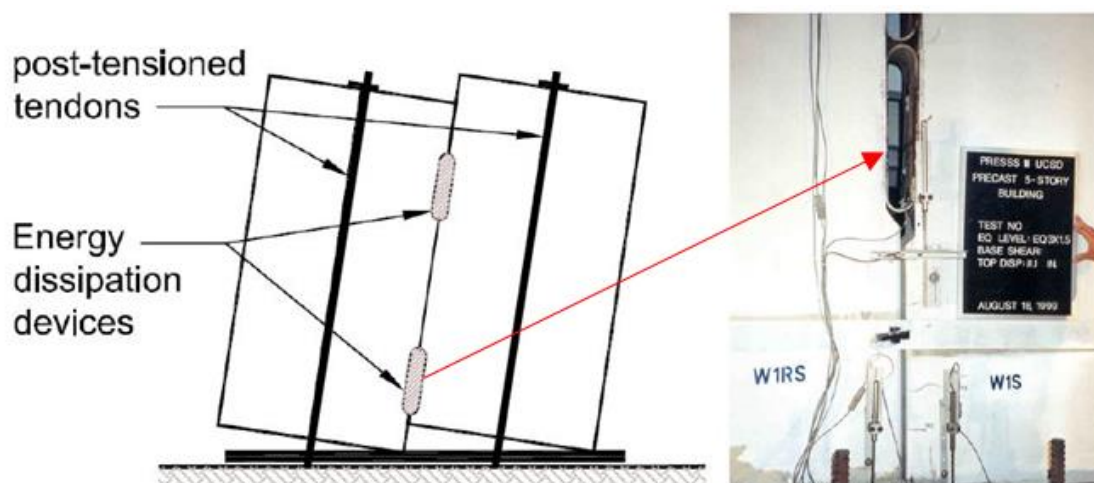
Precast concrete post-tensioned rocking wall with u-shaped lateral dissipator (Stanton 2003)
